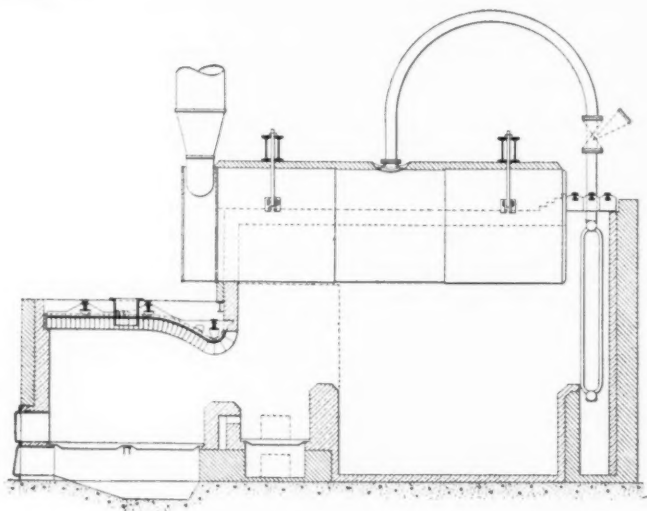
SETTING FOR HORIZONTAL-RETURN TUBULAR BOILER
